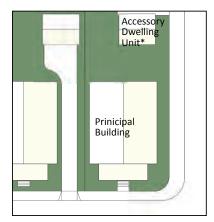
Plan View, Front Yard House (Illustrative)
